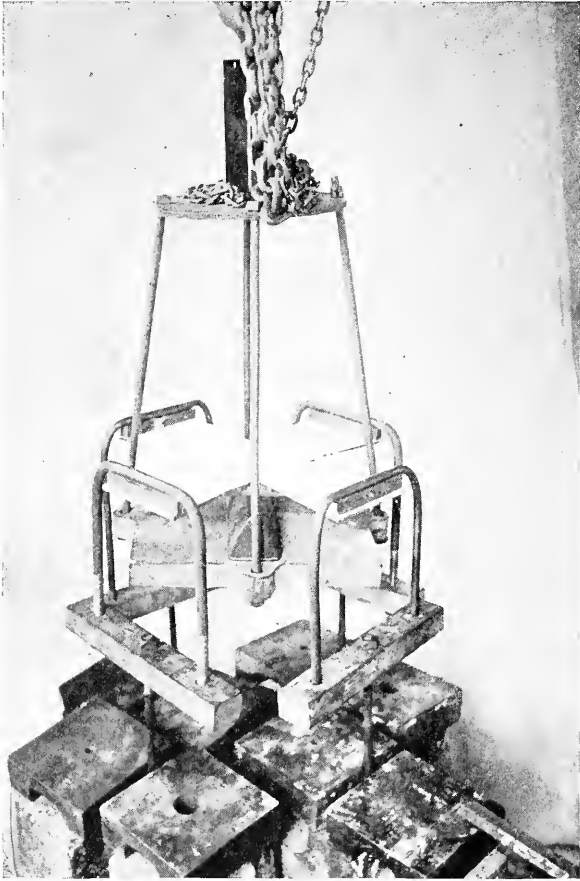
VIEW SHOWING CROSS-BENDING TEST SPECIMEN UNDER LOAD.
